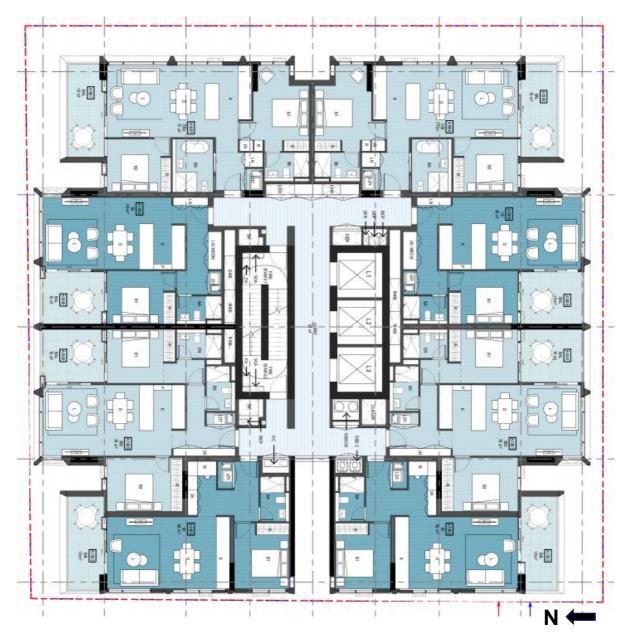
| Typical residential floor layout – Levels 19 to 21 (source: Applicant's RtS)
